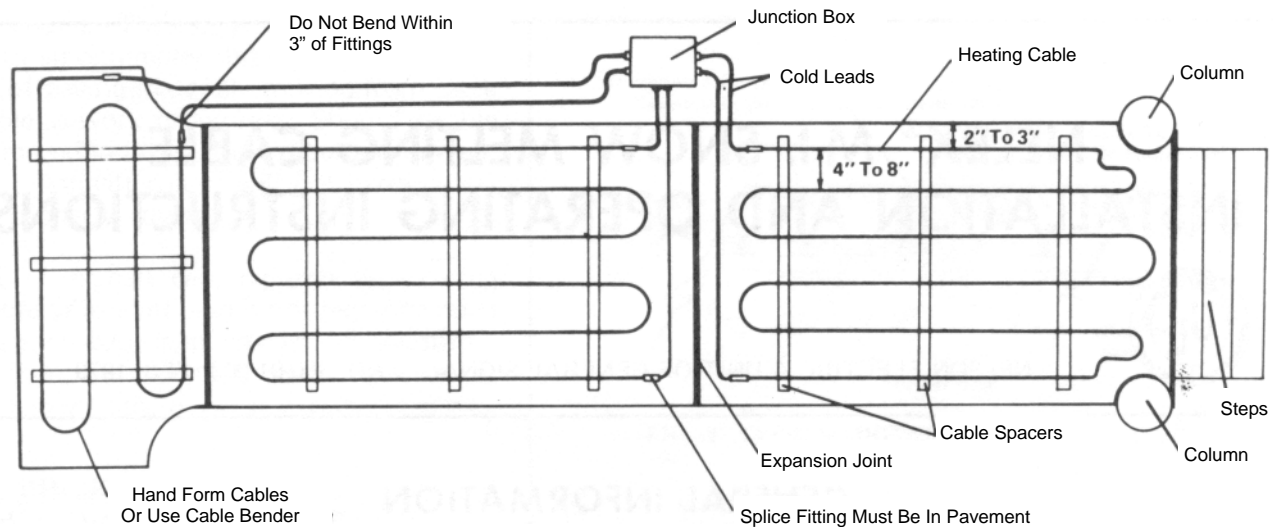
TYPICAL SNOW MELTING SYSTEM
